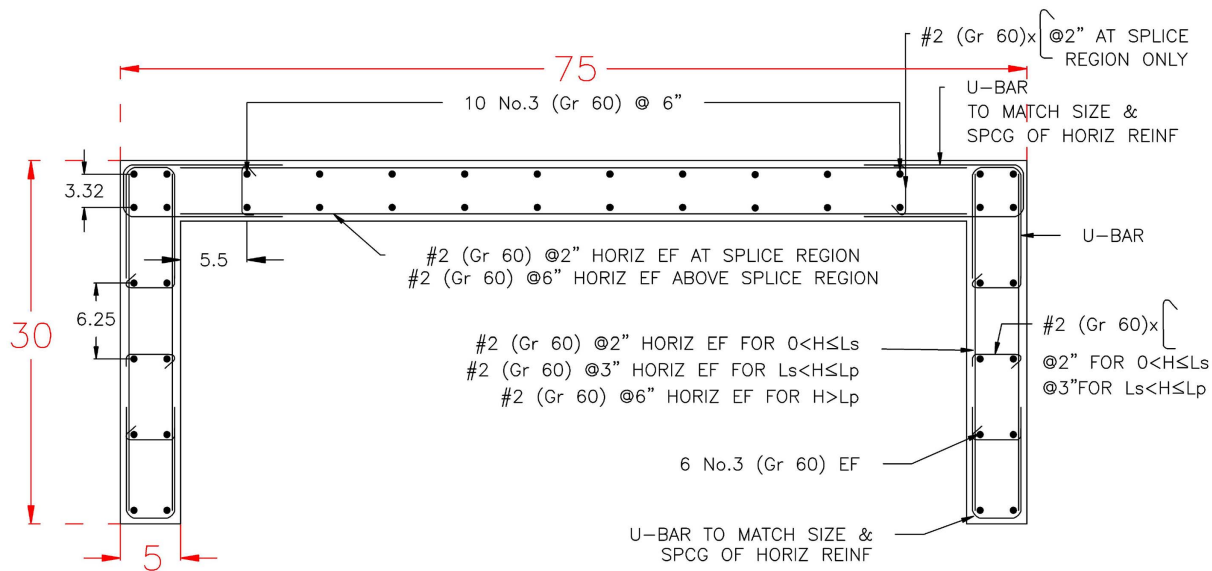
Cross section and reinforcement of CW-1 (units are in inches, 1 in. = 25.4 mm).
